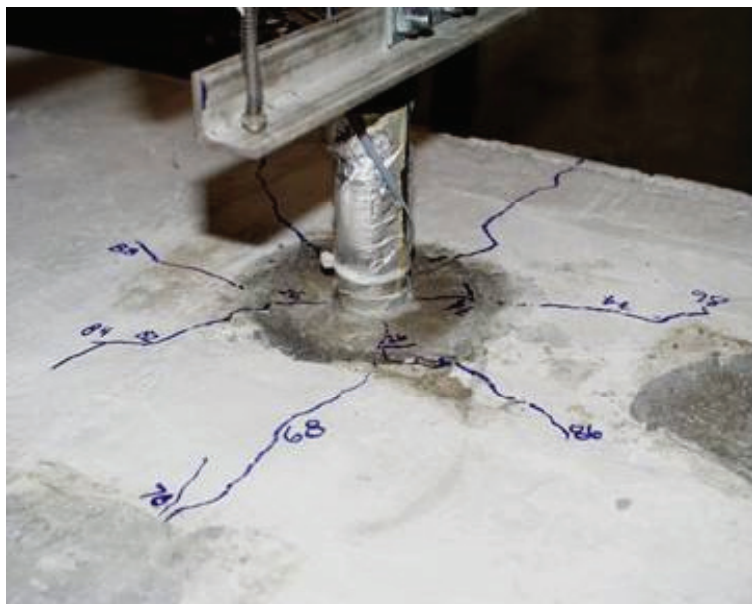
Widespread Splitting Cracks in Concrete
